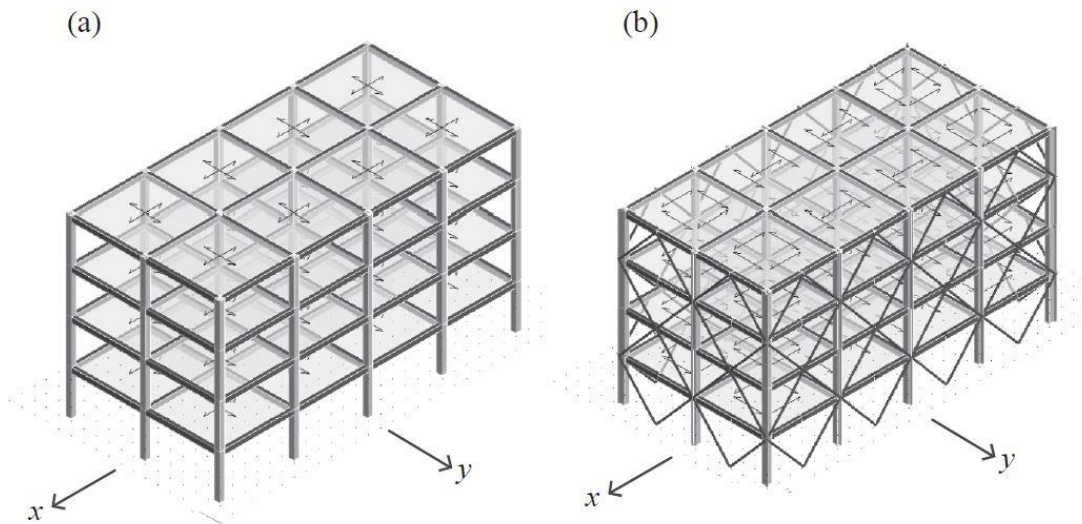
3D views of the FE models of (a) Primary building, (b) Coupled primary-exoskeleton building. (Regio et al. 2019)
